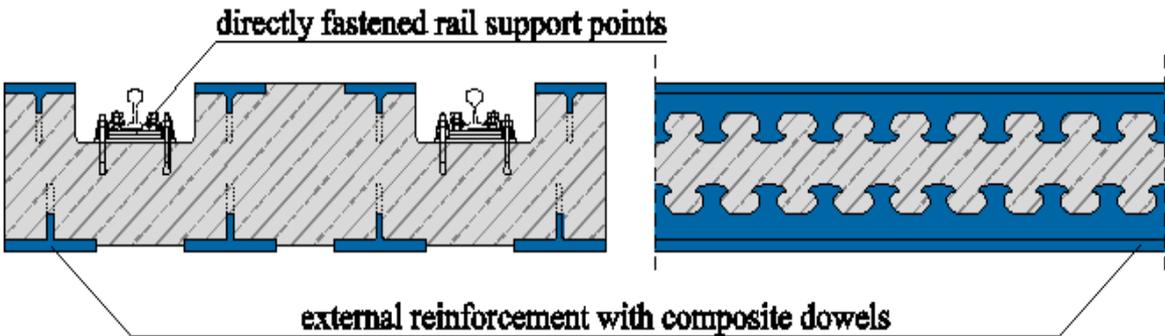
Transverse cross section (left) VFT-Rail® with rail support points directly fastened to the superstructure and composite dowel and longitudinal cross section (right, depicting the clothoidal shape of the dowels)
